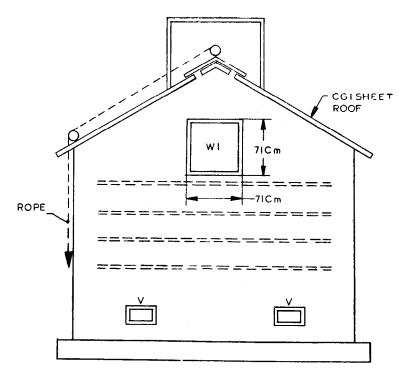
Side Elevation on BC Side (Andhra Barn)
